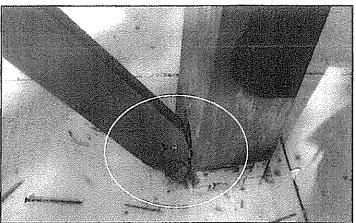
Main sewer line at access pit. Building plans show cast iron. Actual material appears to be PVC.
